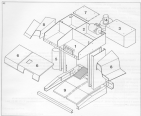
shows a cross-section of a building with a central vertical shaft and a large open area on the ground floor. The diagram highlights the structural elements and the layout of the interior spaces.
